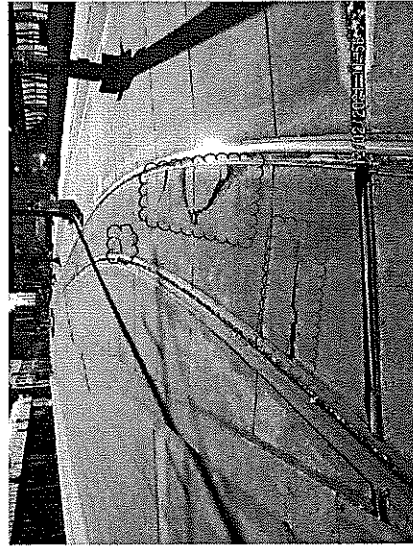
CEDAR ST. BRIDGE OVER I-35E
